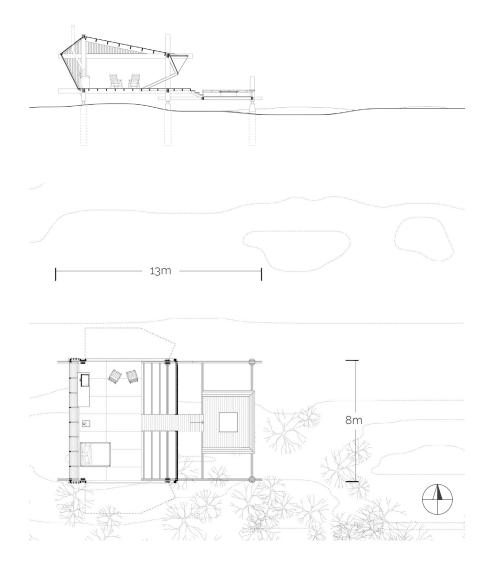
Section and floor plan of Archetype 2.0. Vector Artwork. Author's Own (2020).
